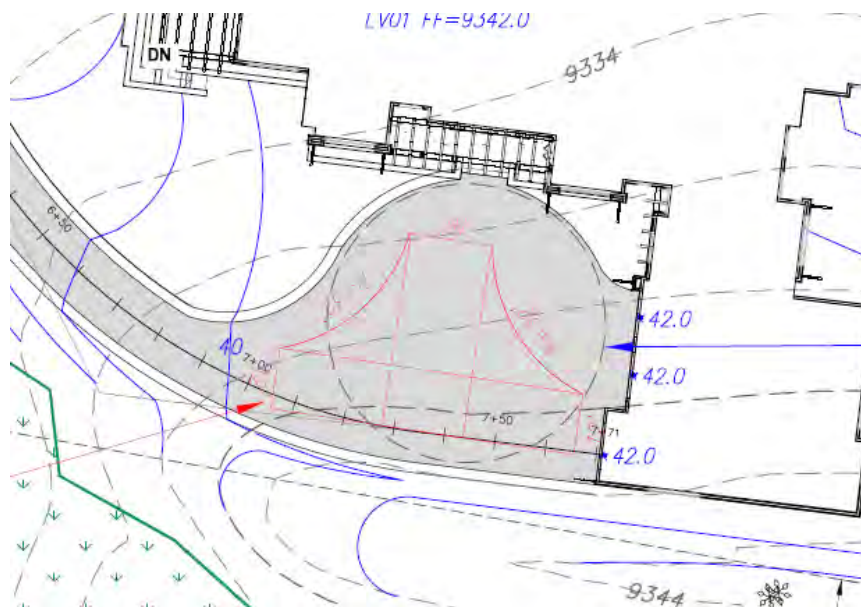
Driveway Plan – TFPD Standard Hammerhead Turn-Around
